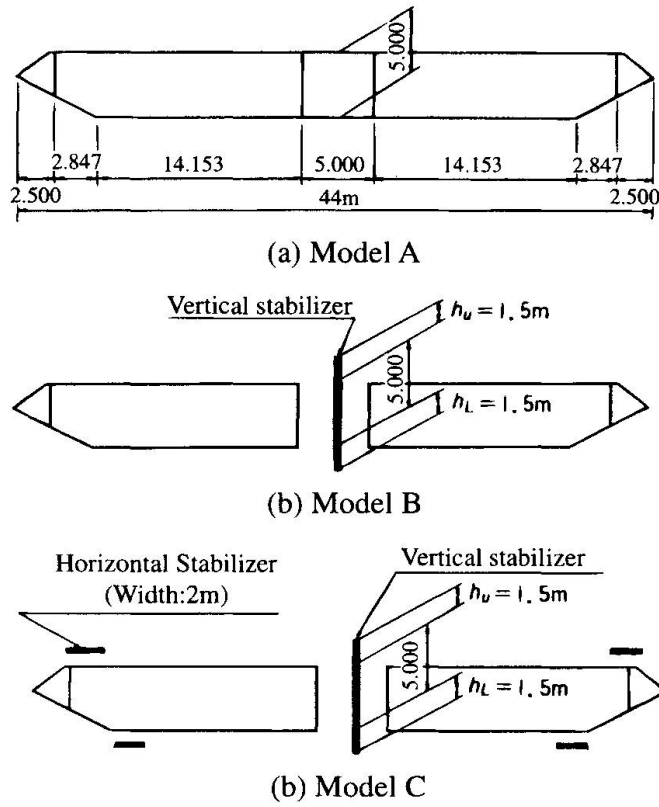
Flat box girder with 5m depth and 5m center slot width
